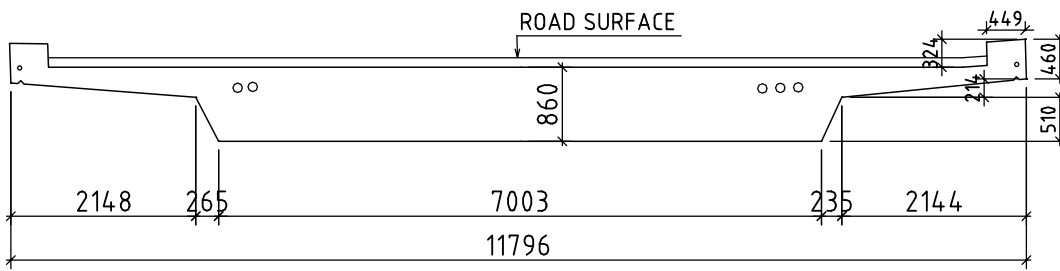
Haavistonjoki Bridge. Cross-section.
